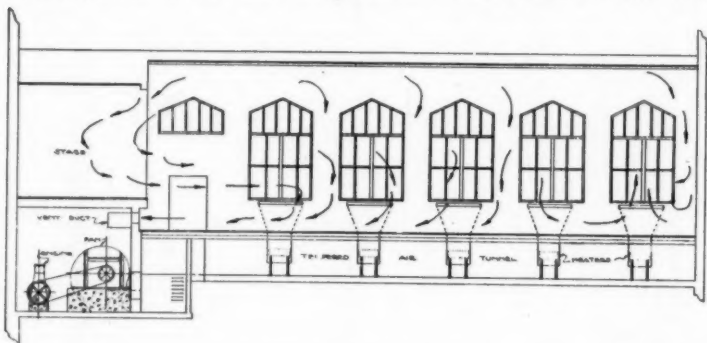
LONGITUDINAL SECTION AT CENTER OF ROOM, LOOKING SOUTH
